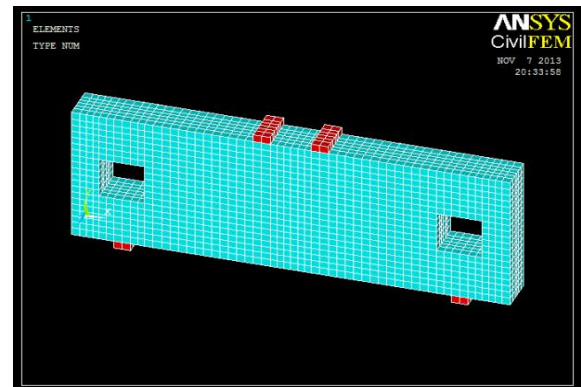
Typical Model for Deep Beam with Opening at Support Location
